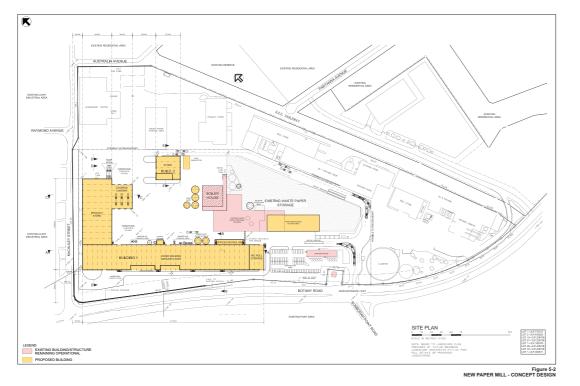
Paper Mill Site Plan - (Source: SBA)
